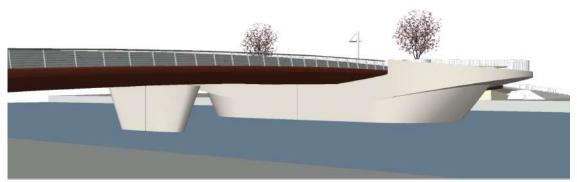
Dodder Bridge East and West Bascule Substructure
